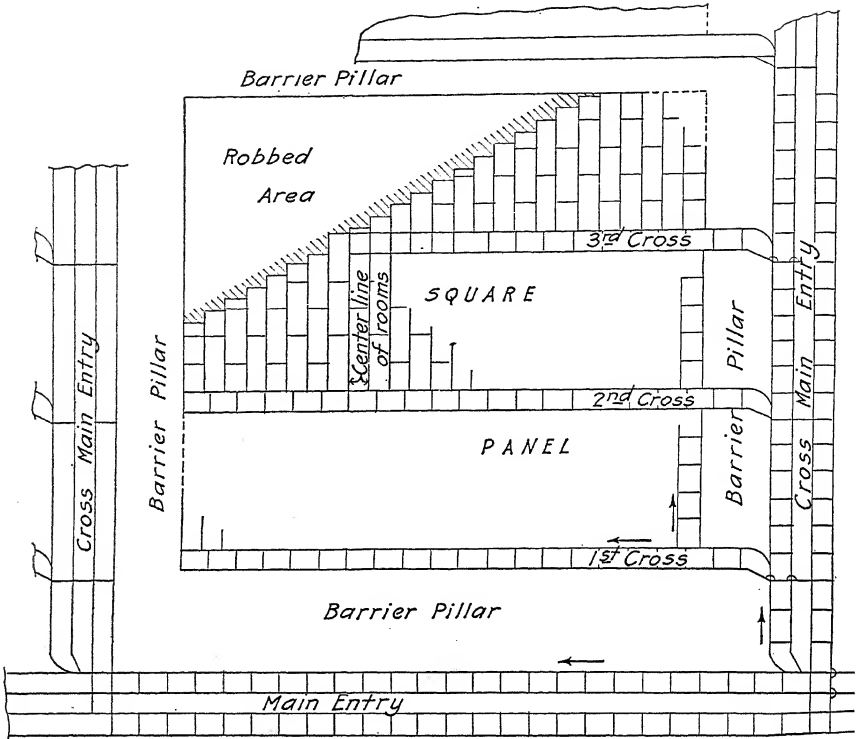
TYPICAL PLAN OF MINING ON THE PANEL SYSTEM.
